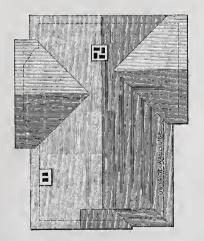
Roof Plan.—Scale, $\frac{1}{16}$ Inch to the Foot.
